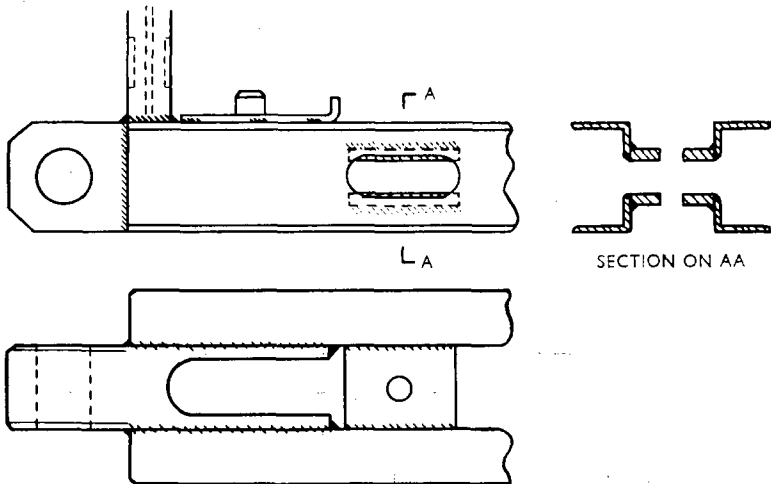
DETAIL OF BAILEY BRIDGE PANEL
